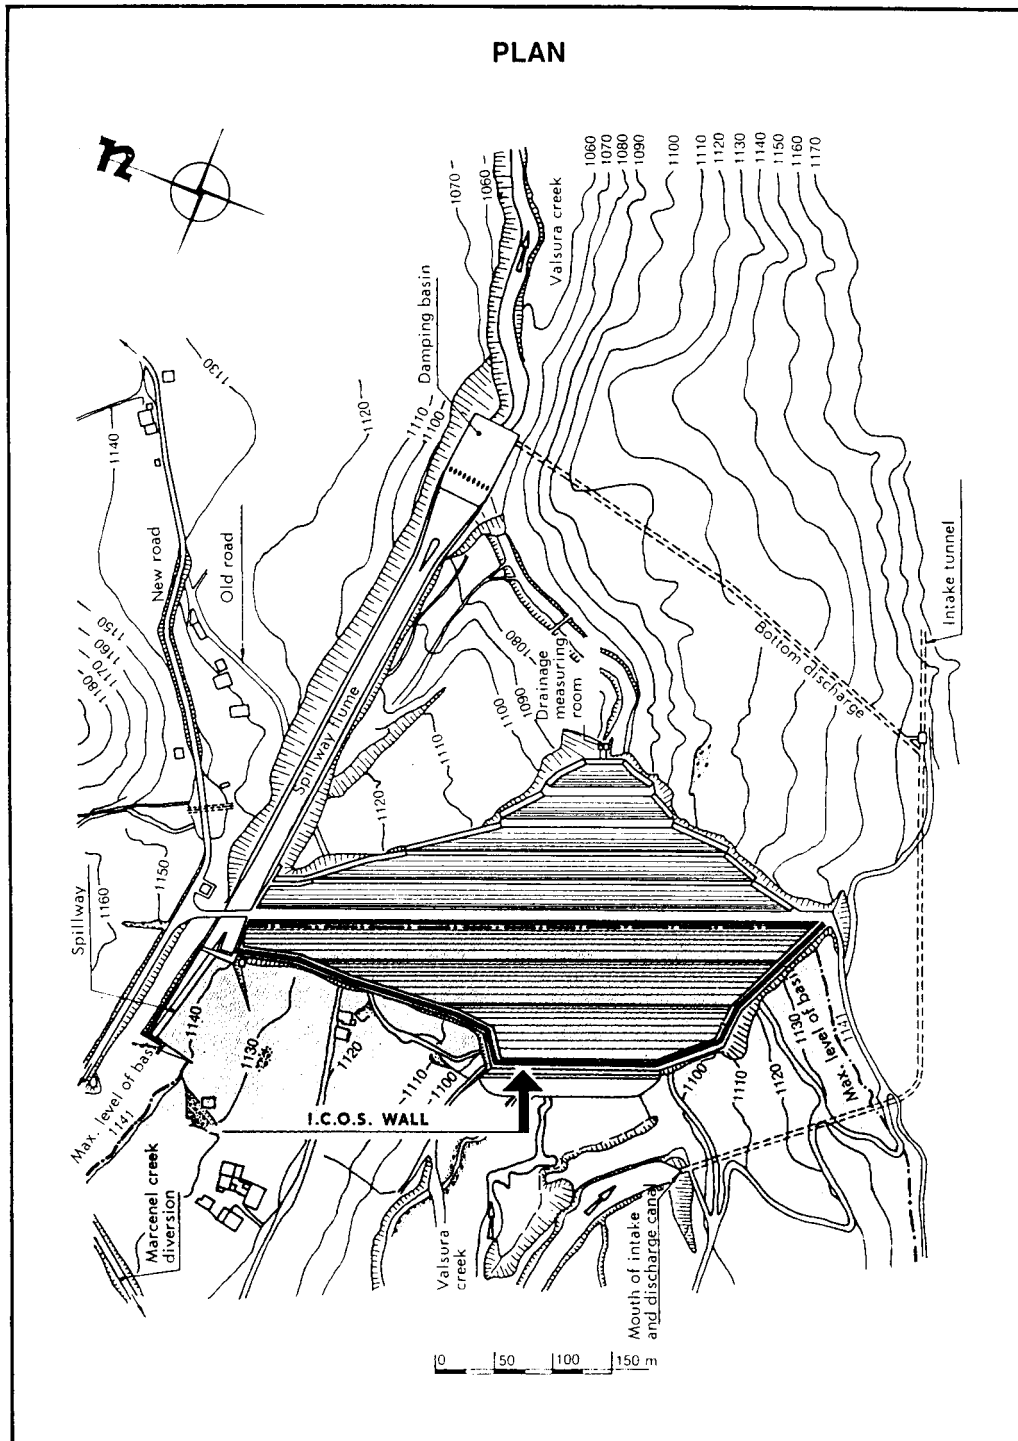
Zoccole dam: Layout of embankment and apurtenances
